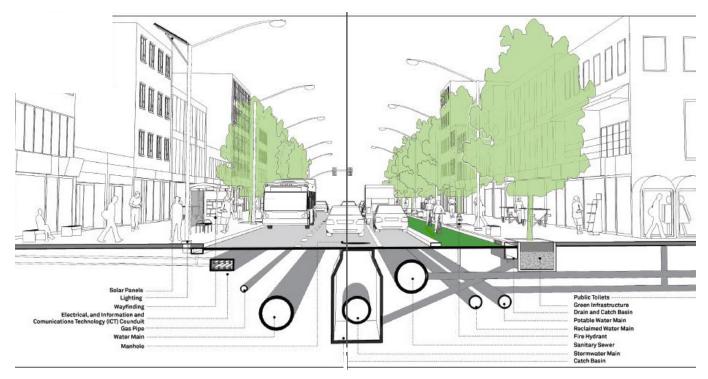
31: Provision of Underground Utilities based on the street type and context Source: Global Street Design Guide, NATCO
